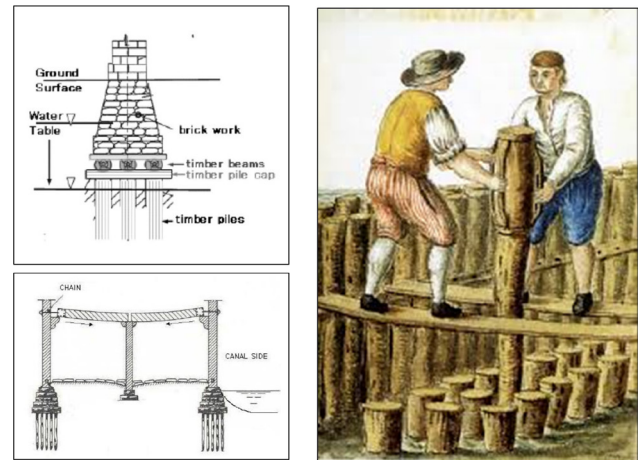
Foundations of Venetian buildings in the Middle Ages: pile foundations and deep-shallow combination (left); wooden driven pile installation (right)
